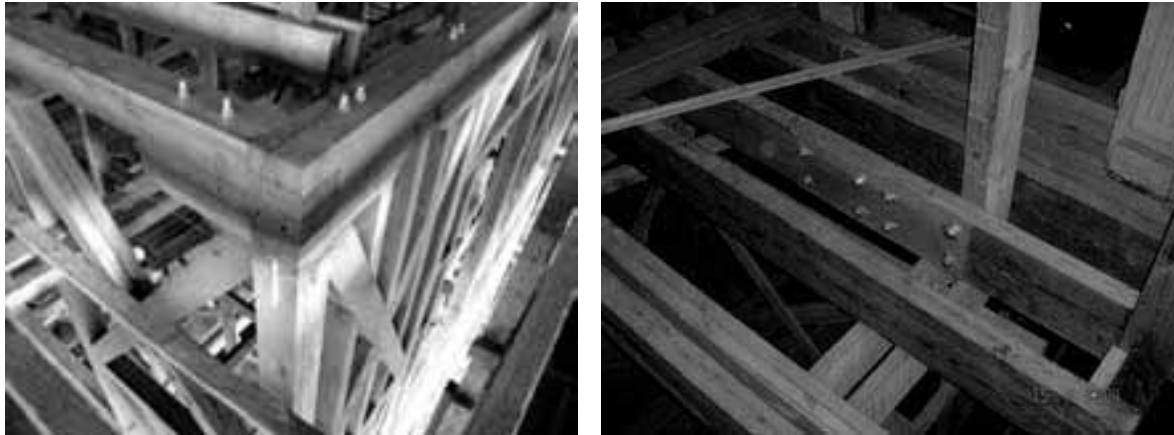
Reinforcing the joints of the timber buildings using mechanical fasteners (Can Binan's archives).
